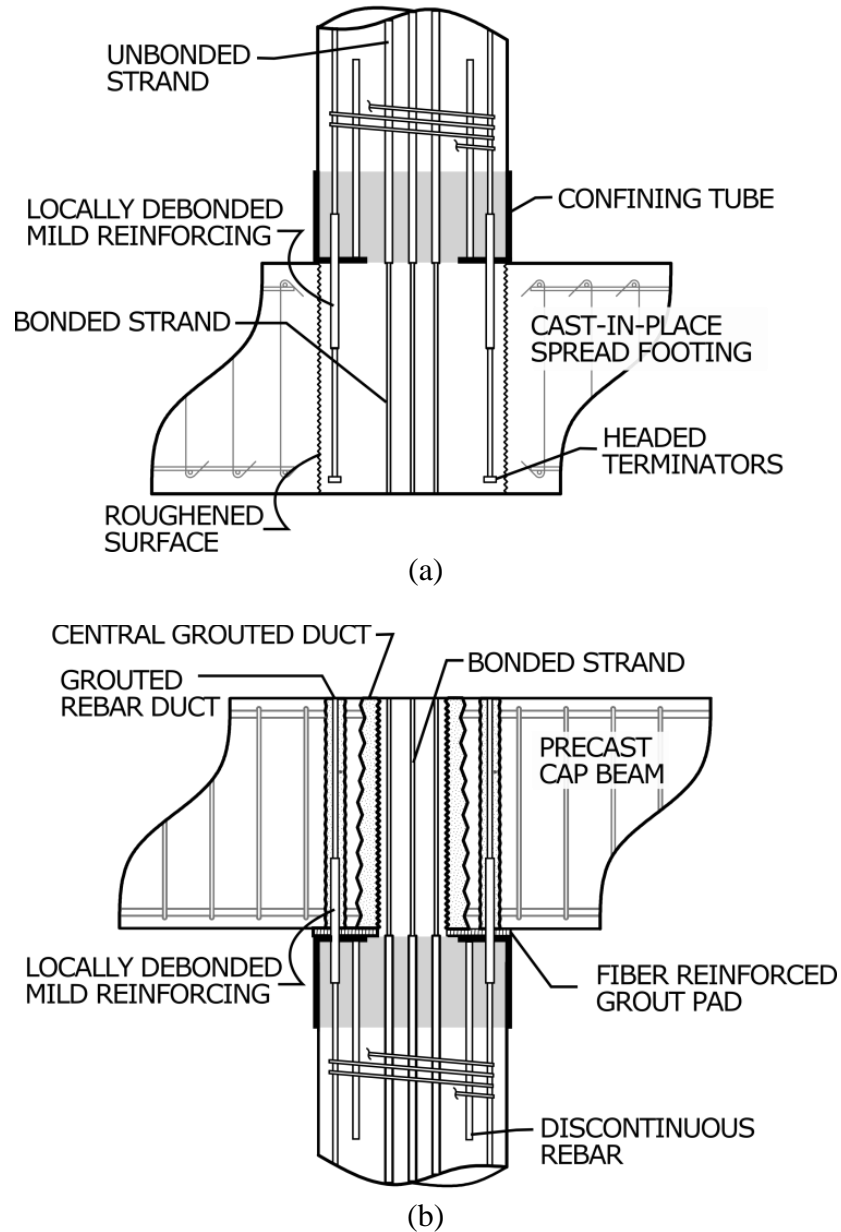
Precast connections for the proposed pre-tensioned bridge system. (a) “Wet” socket footing connection (b) “Hybrid-bar-socket” cap beam connection.
